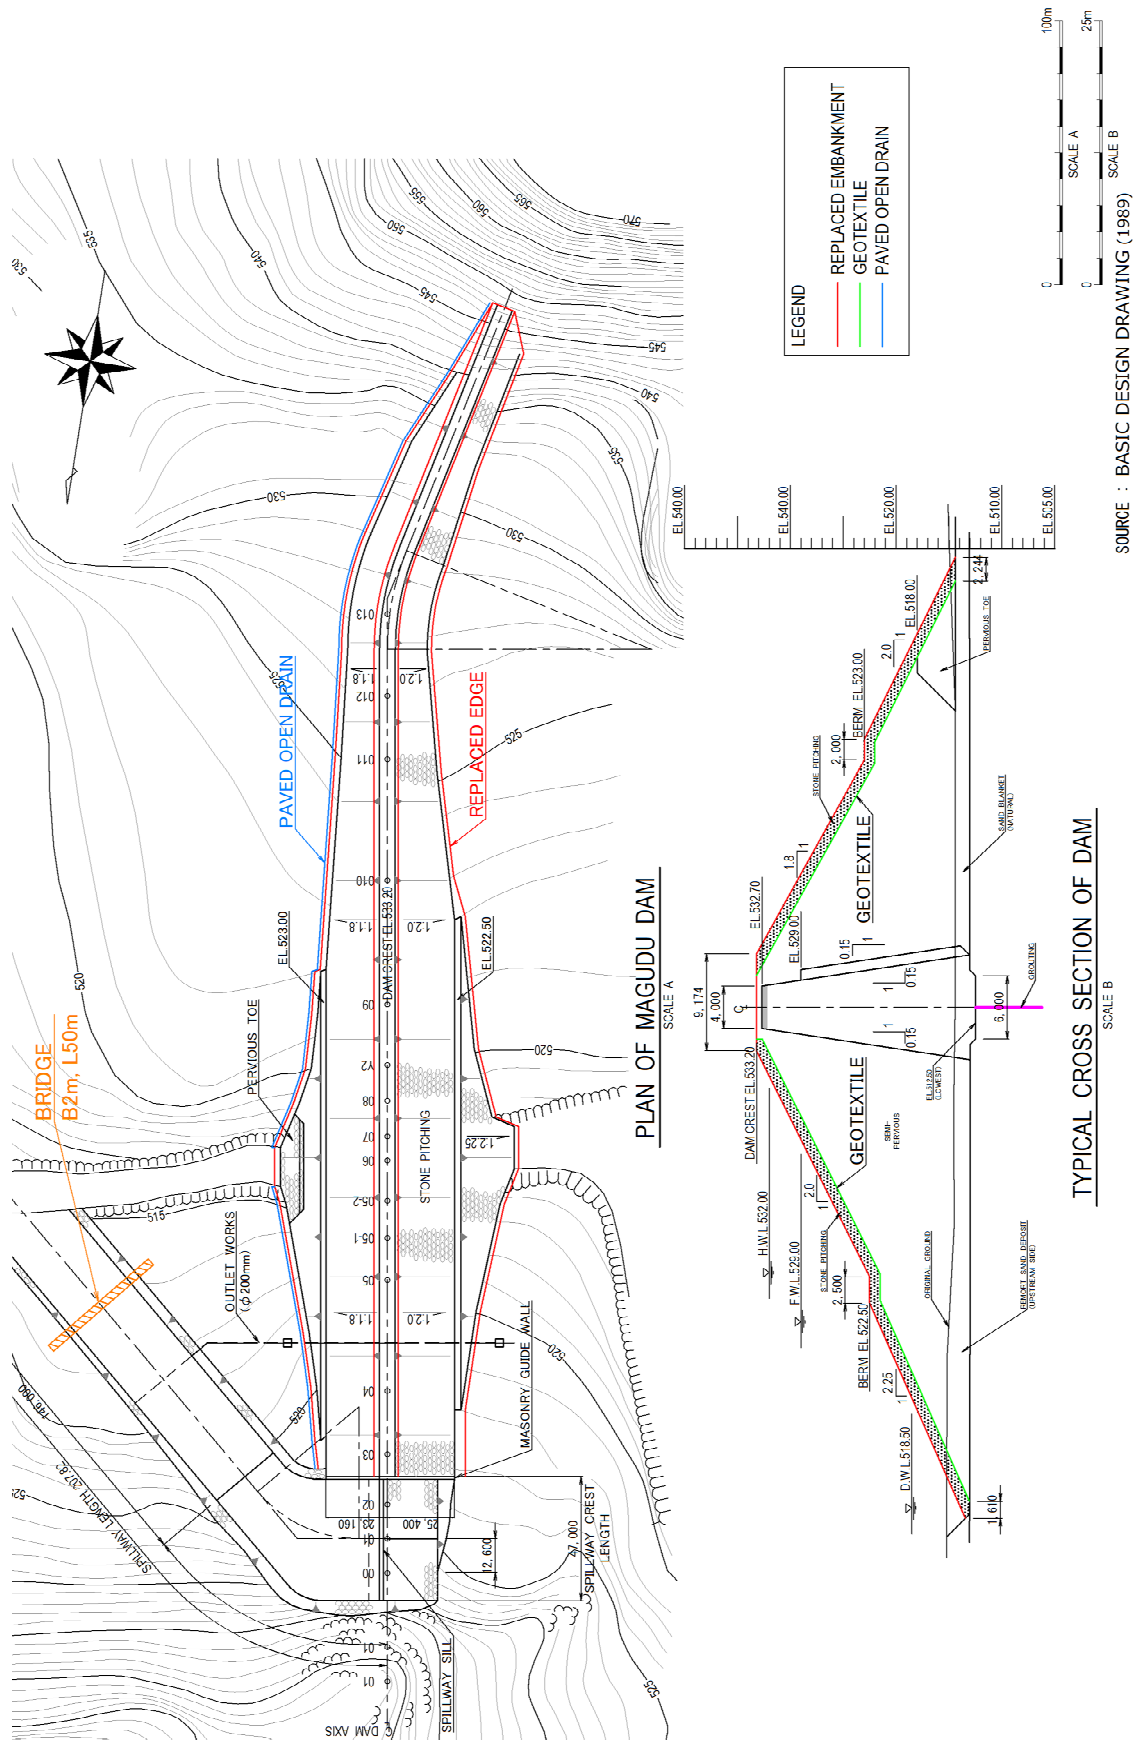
The Typical Cross-Section and Plan of the Embankment Rehabilitation (Magudu Dam)
